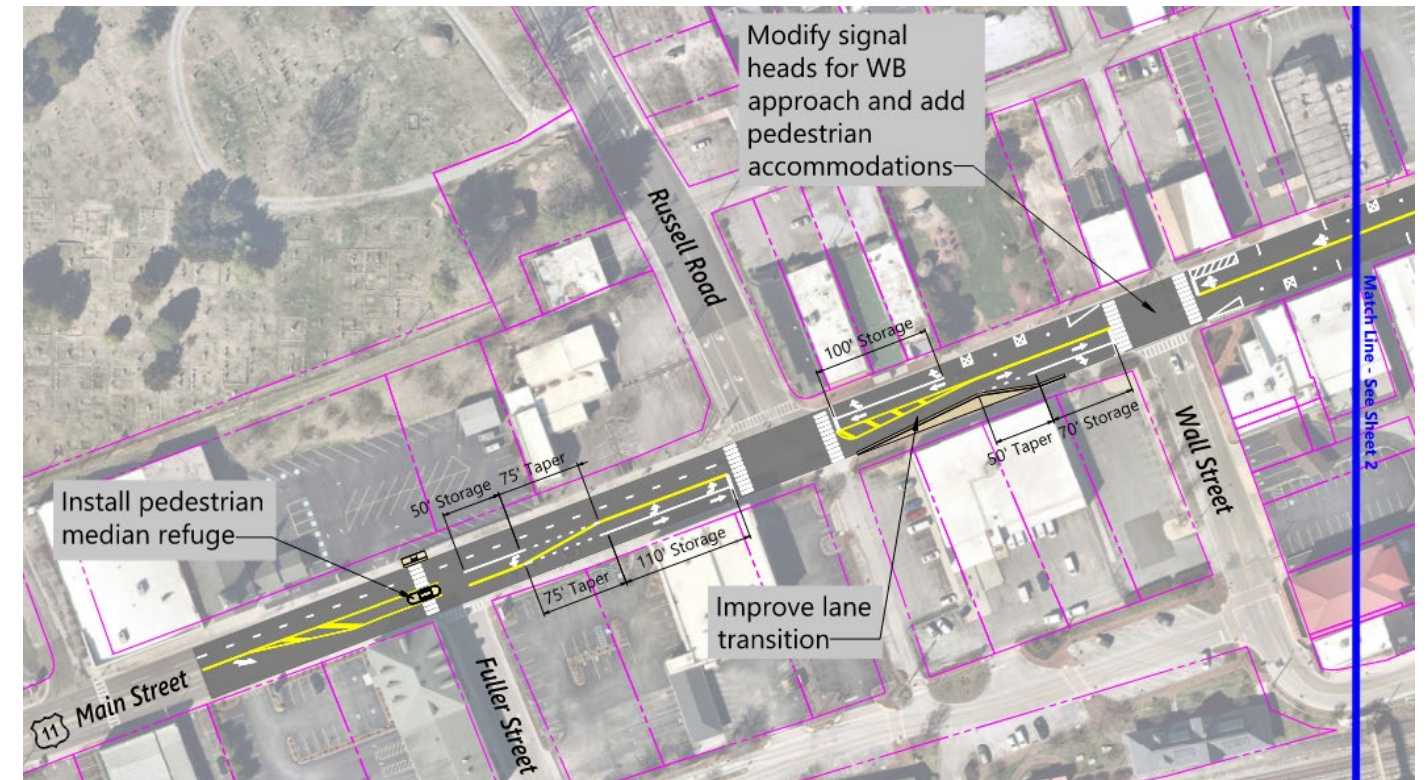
US 11 (Main Street) between Fuller Street and Wall Street
